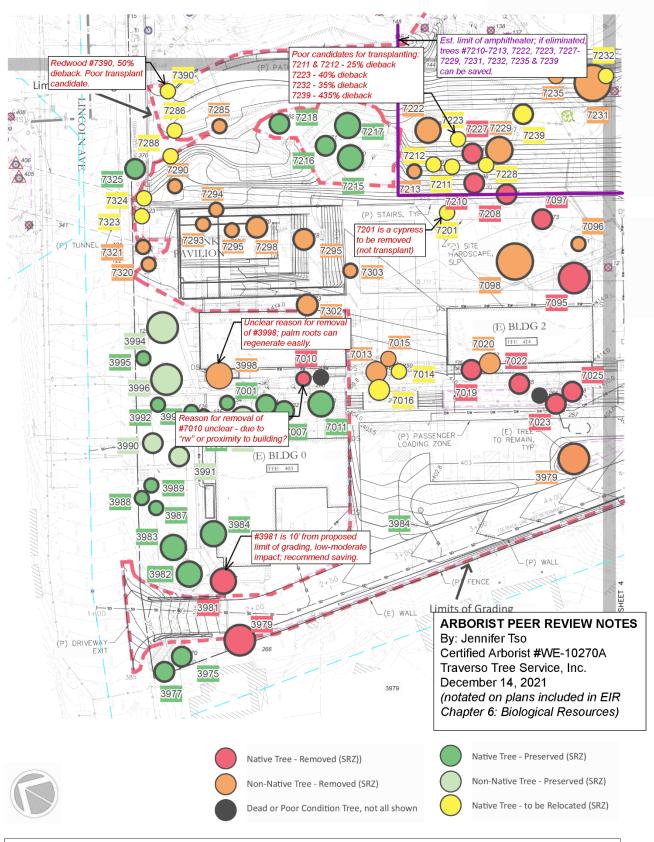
Disposition of Protected Trees, Northwest Quadrant of Proposed South Campus
